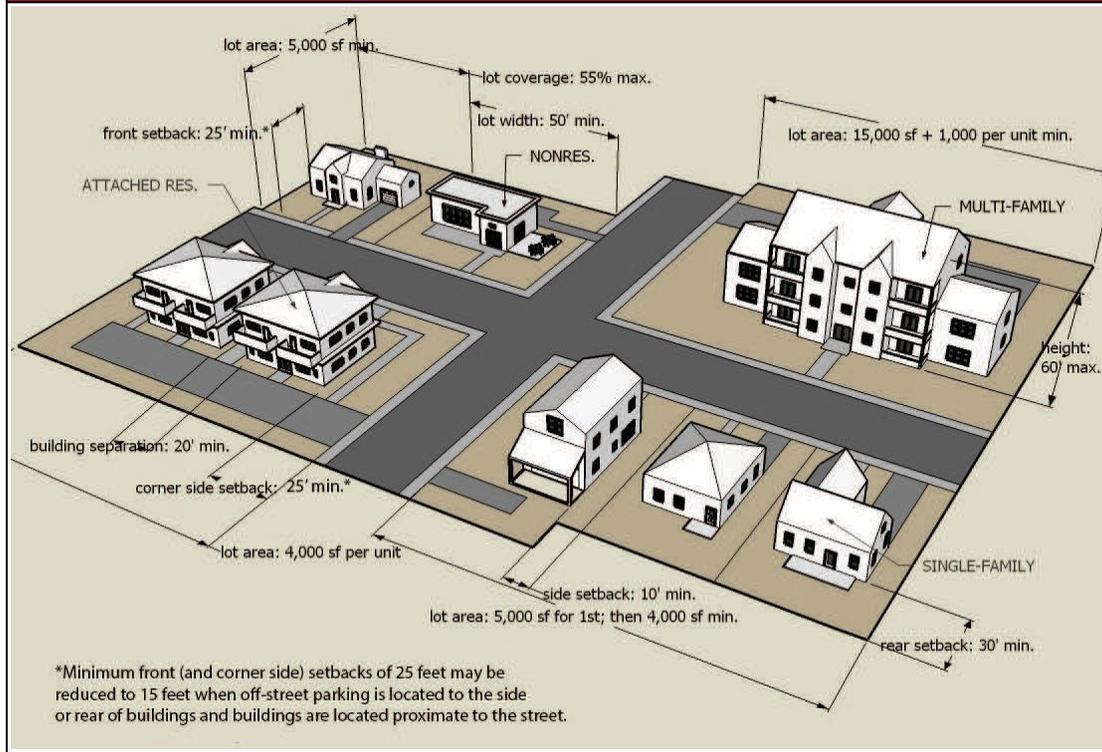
D.5.c: MR-5 Typical Building/Lot Configuration
